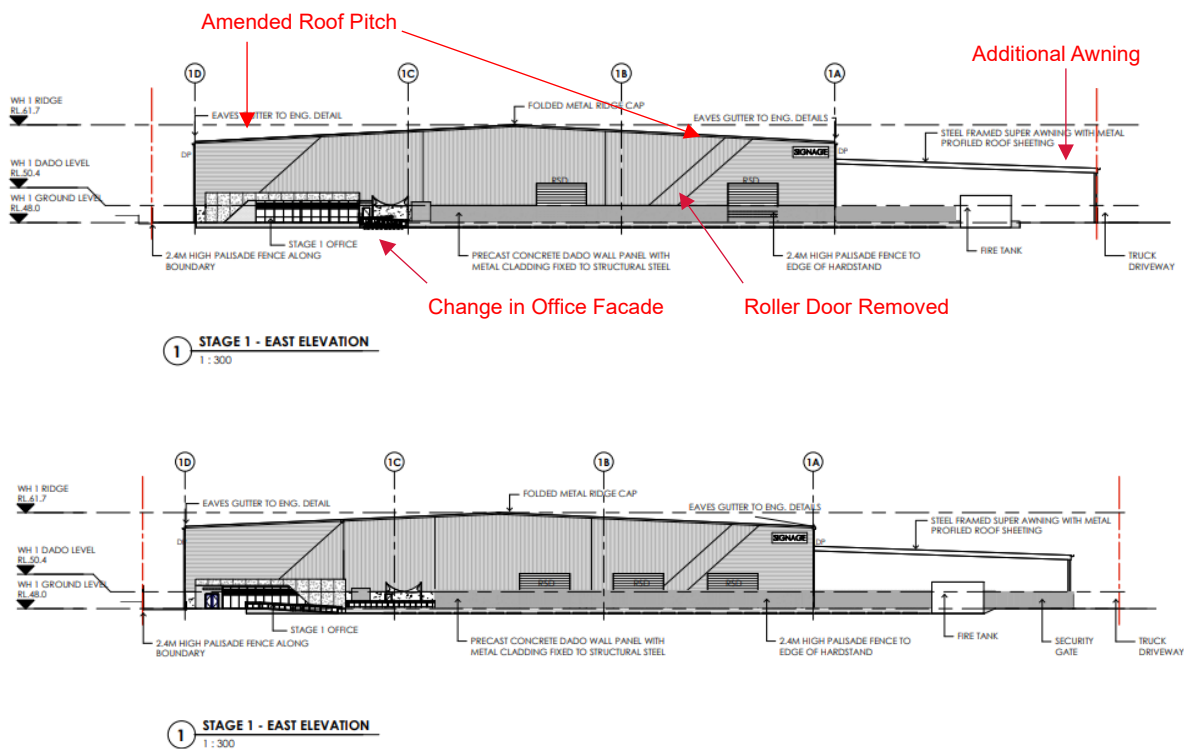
| Proposed eastern elevation (top figure) compared to approved eastern elevation (lower figure) via Culverston Rd.
